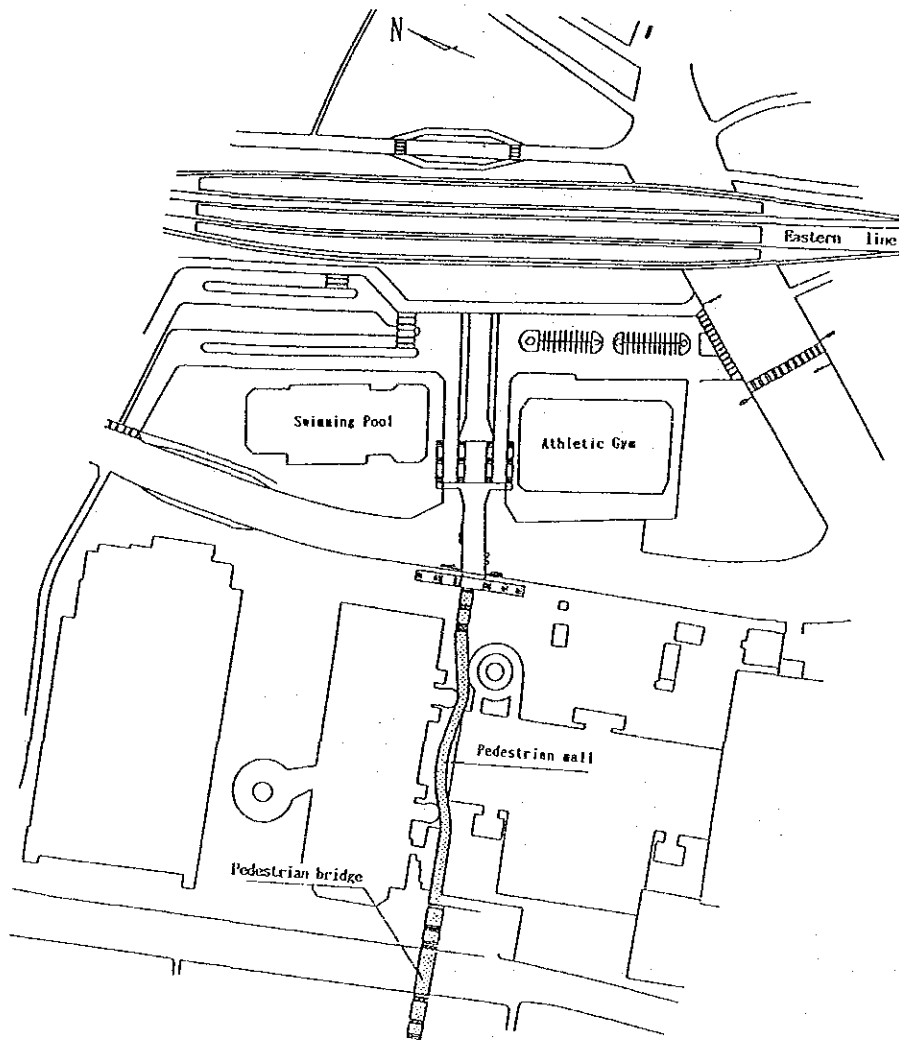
Pasar Senen Improvement Plan (Second Stage)
